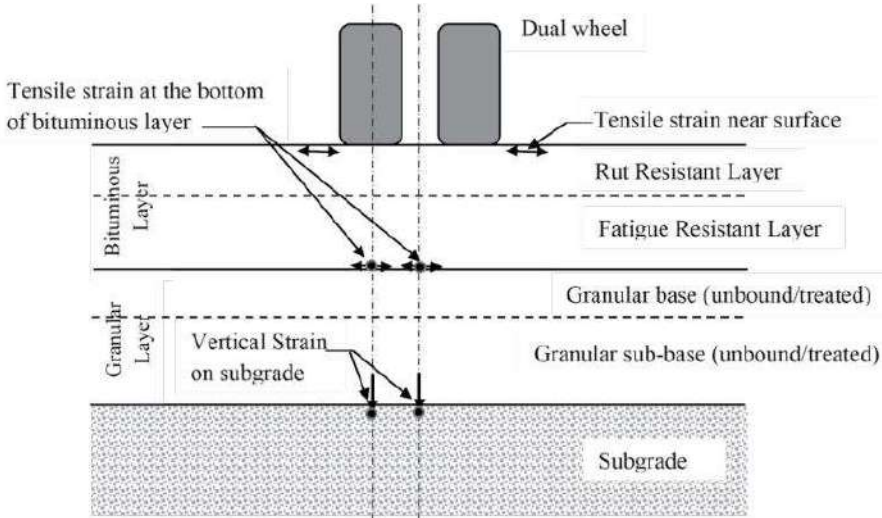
Typical cross-section of flexible pavement (IRC 37 2018)
